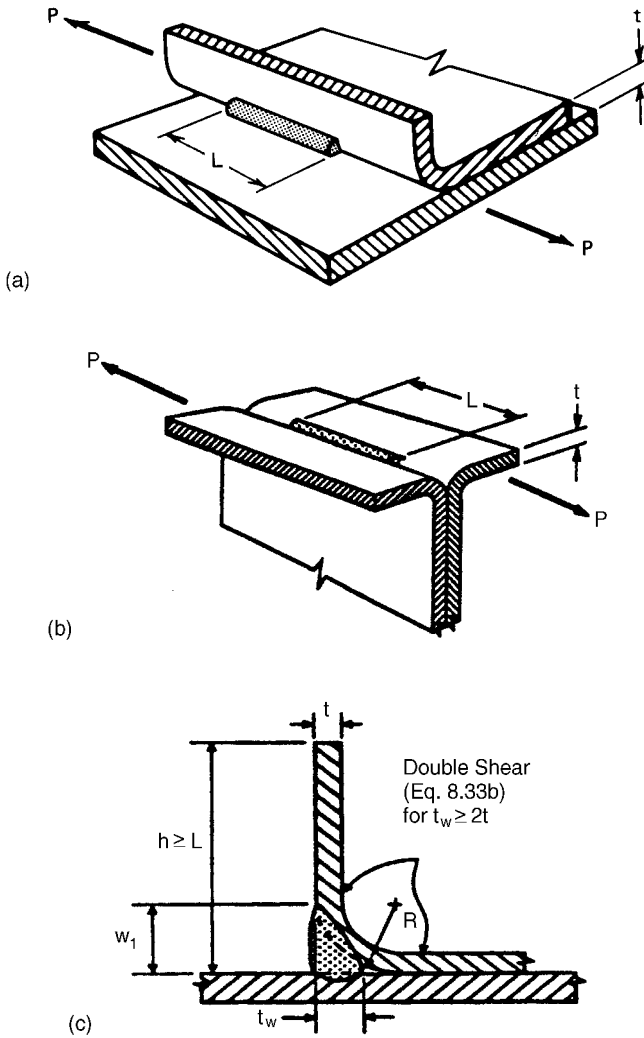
(a) Shear in longitudinal flare bevel groove weld.^{1,314} (b) Shear in longitudinal flare V-groove weld.^{1,314} (c) Flare bevel groove weld (filled flush to surface, $w_1 = R$).^{1,314}
